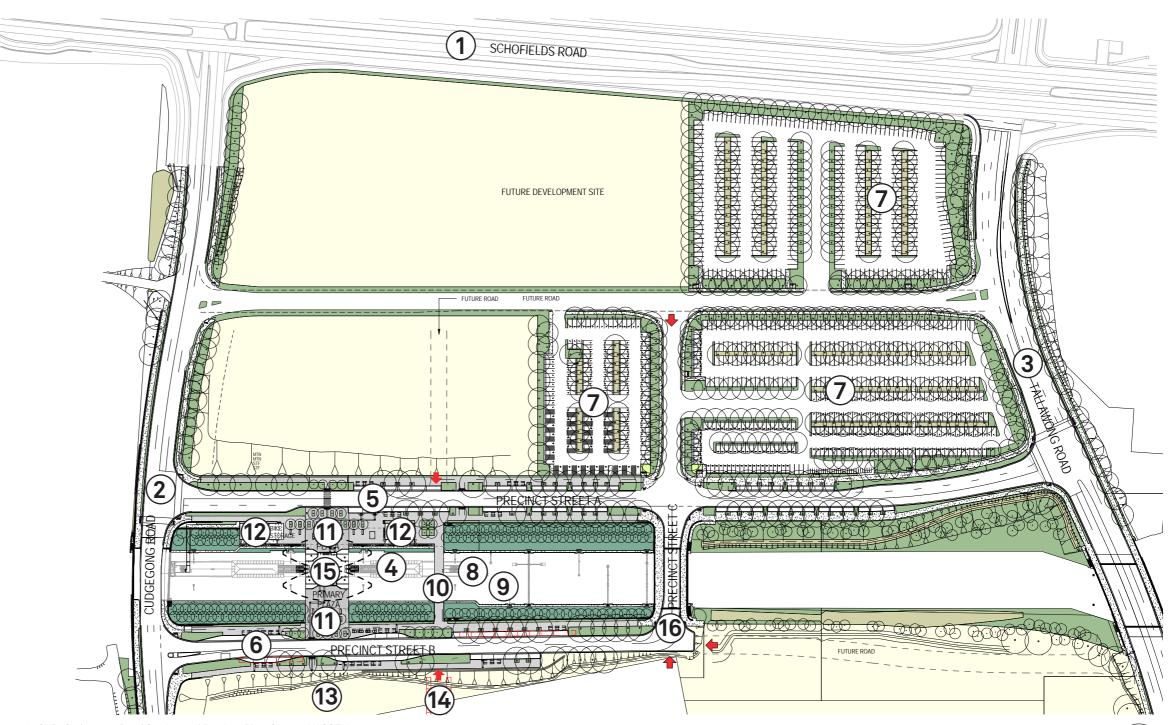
CUD\_Cudgegong Road Station and Precinct Plan. Source: HASSELL.
